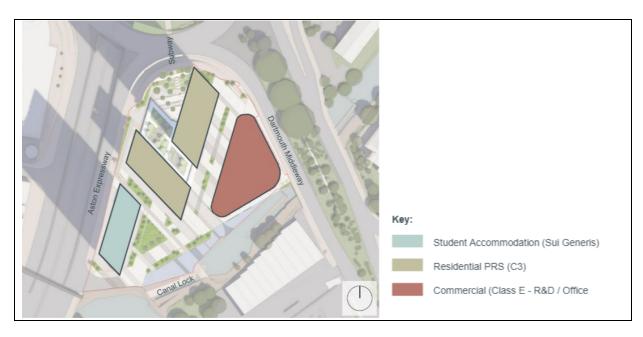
Proposed site plan showing indicative layout and uses (Source: Design Code)
